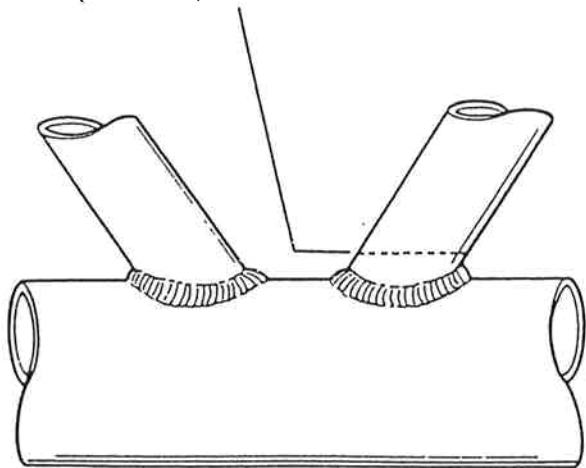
Cutting Off Damaged Tubular Lacings
